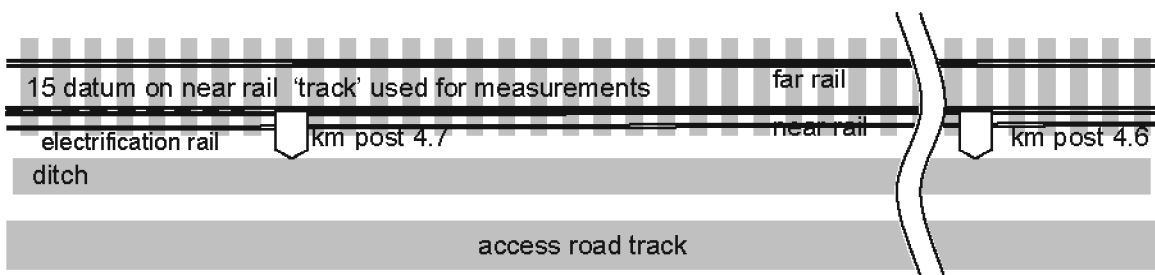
Layout of the test section of track at Wildenrath (— reference section, - - - datum)
